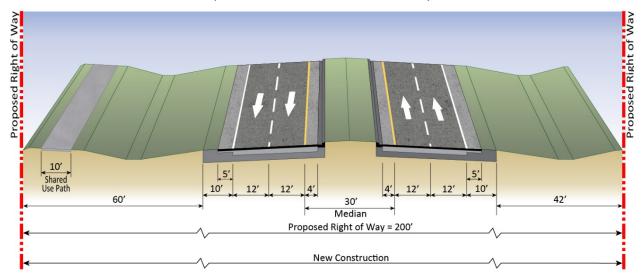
SR 29 Bypass Typical Section from CR 846 to Gopher Ridge Road (Central Alternative #2)
